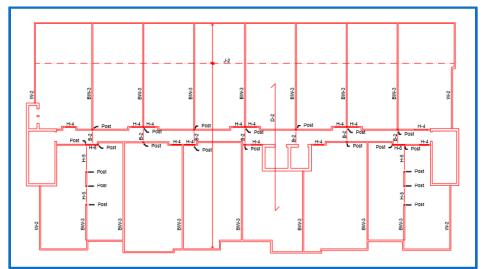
3<sup>rd</sup> Floor Framing Plan
